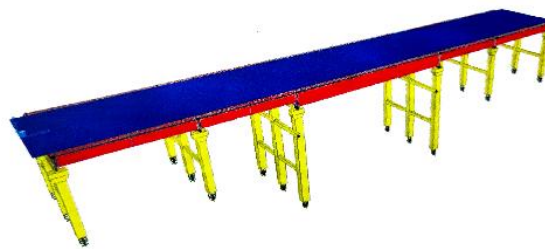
SAP model of Study Bridge with LRB Isolator at the bottom pier
